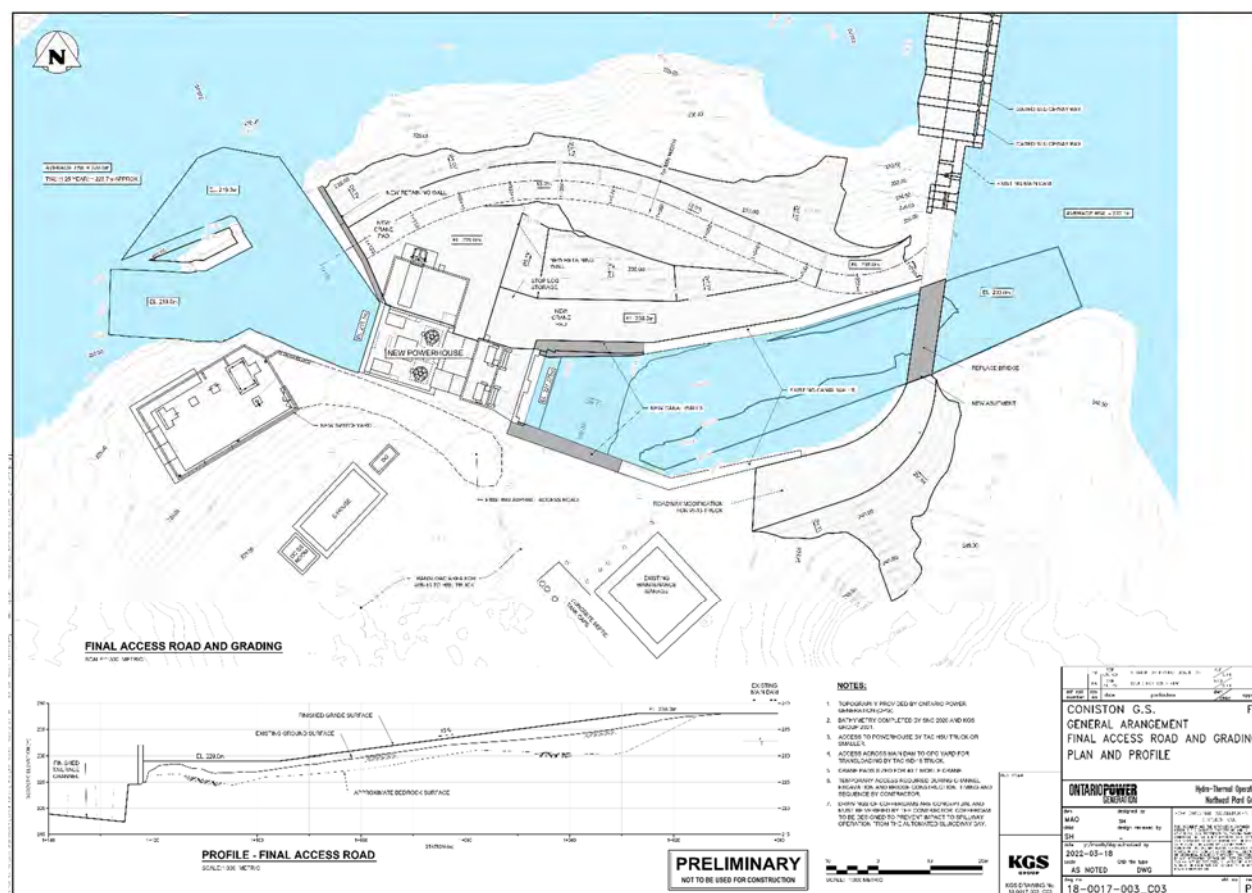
Proposed Powerhouse Arrangement Final Access Road and Grading Plan and Profile
